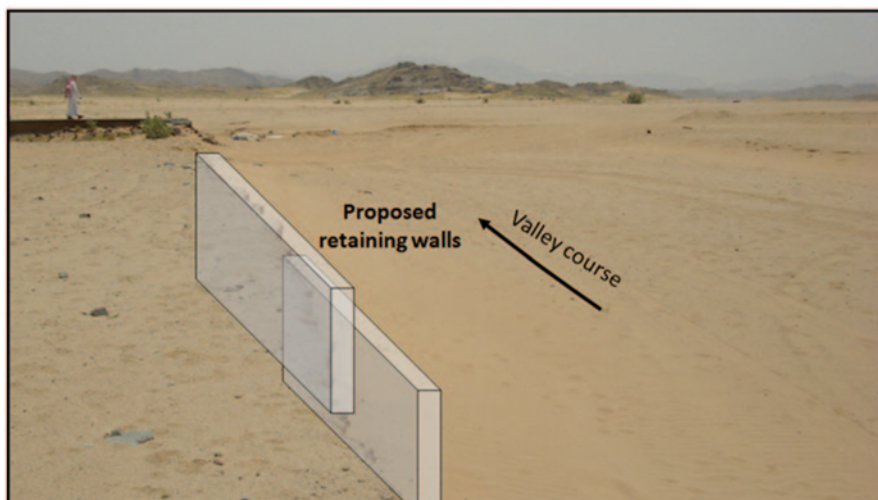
Proposed cement retaining wall along valleys flood plains
